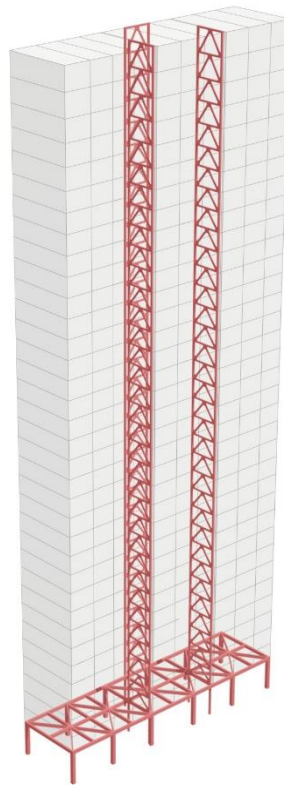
Structural endoskeleton supporting base chassis modules.
